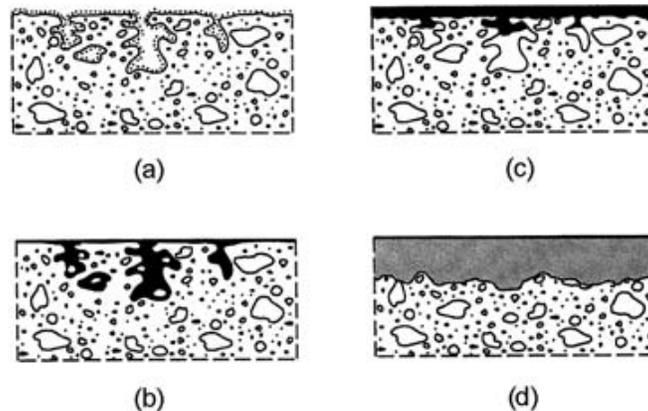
Four different types of protective treatments for concrete: (a) hydrophobic, (b) sealers, (c) membrane-building coatings, and (d) mortar and concrete coatings [4].
